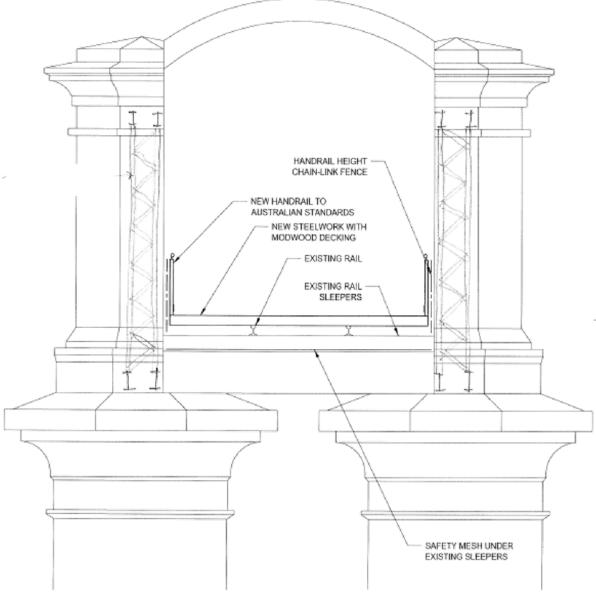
Extract from Design Drawings showing the proposed decking structure to the Railway Bridge
